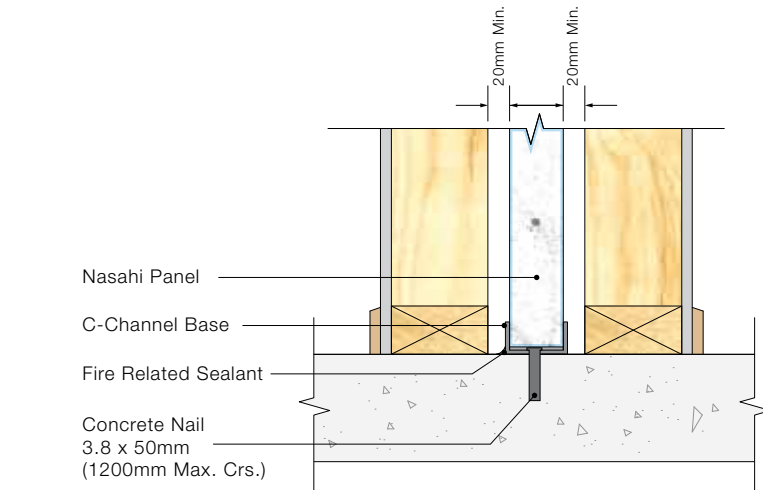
MULTI-STOREY FIRE BOARD INSTALLATION
